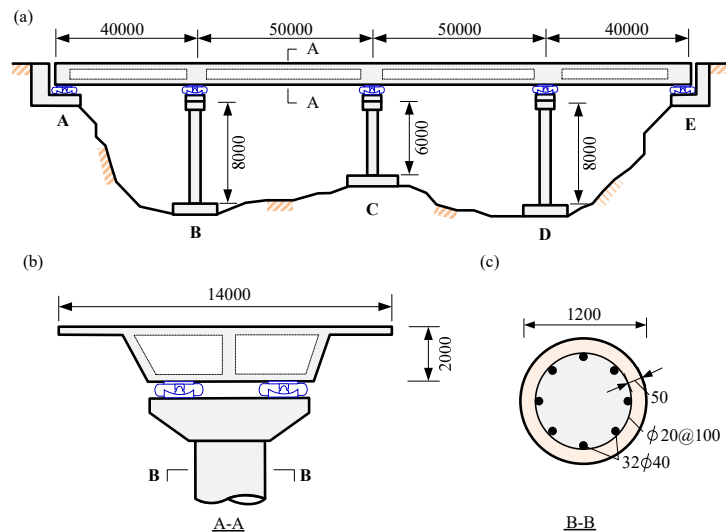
Prototype of the bridge: (a) bridge configuration; (b) elevation view; and (c) section view of pier. (unit: mm)
